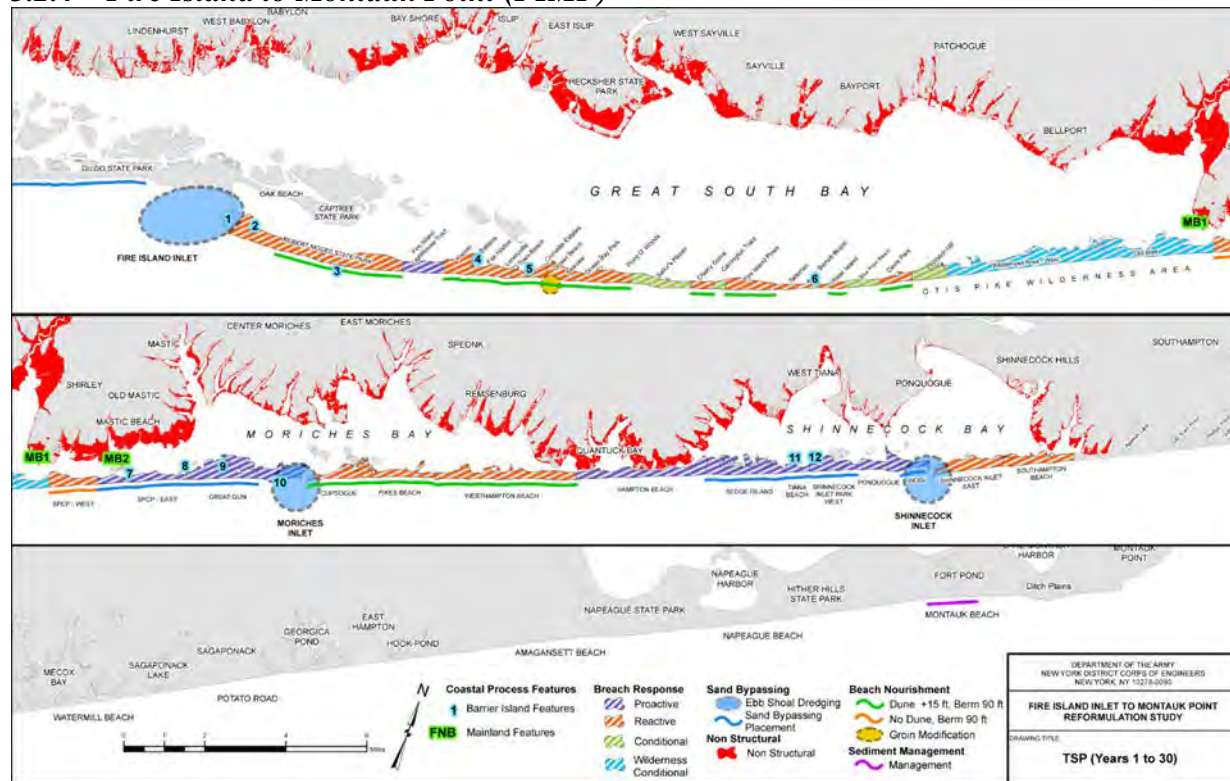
Fire Island to Montauk Point (FIMP), New York – Recommended Plan (Years 1-30)
